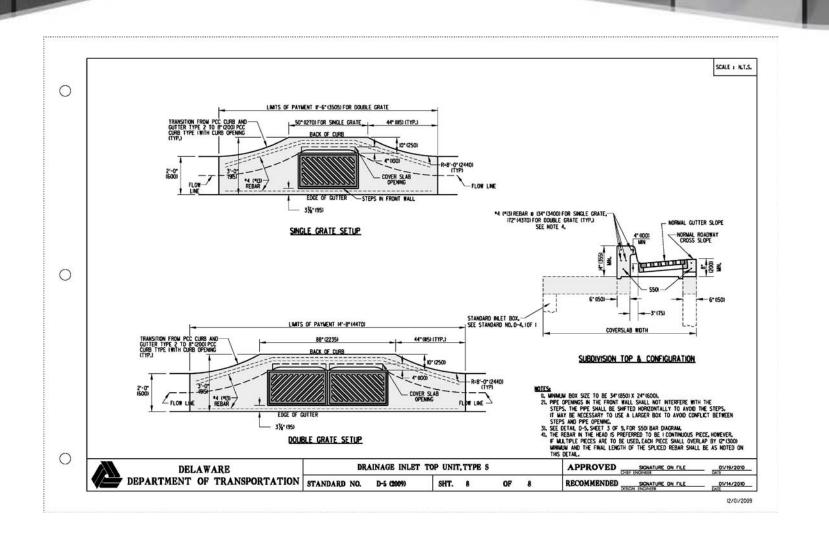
, Sheet 3 of 8 – Drainage Inlet Top Units
